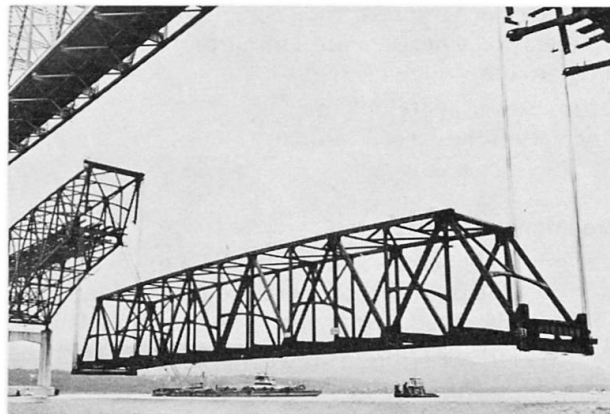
South bridge. Suspended span (152.5 m) free of barges being hoisted by block and tackle into final position
